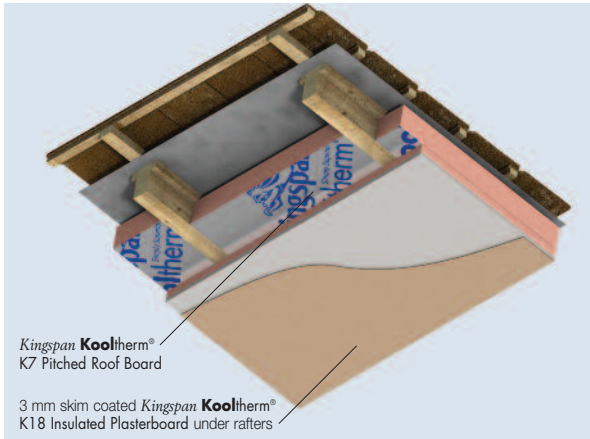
Mechanically fixed to timber rafters with *Kingspan Kooltherm*® K7 Pitched Roof Board between rafters
